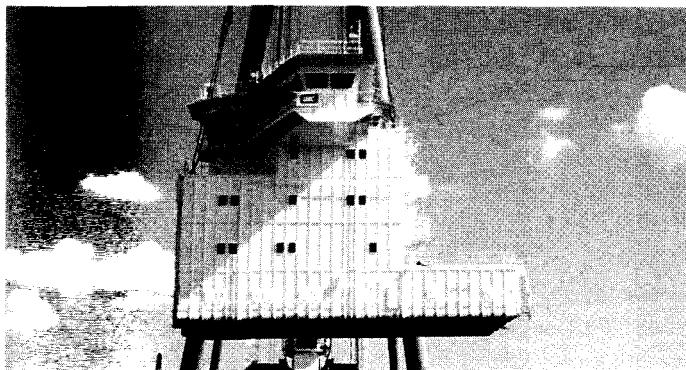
Swedged Deckhouse Exterior Bulkheads
